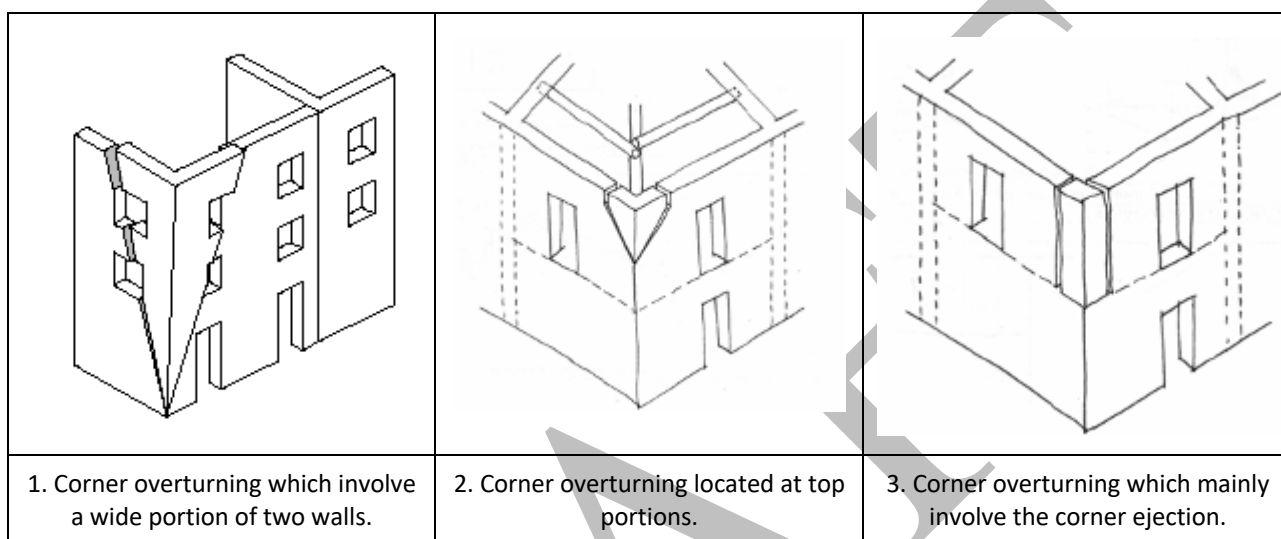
Class B – Damage to out-of-plane loaded walls: examples of sub-class B-a involving the overturning of corners (sketch 1 has been carried from D’Ayala and Speranza 2003).
